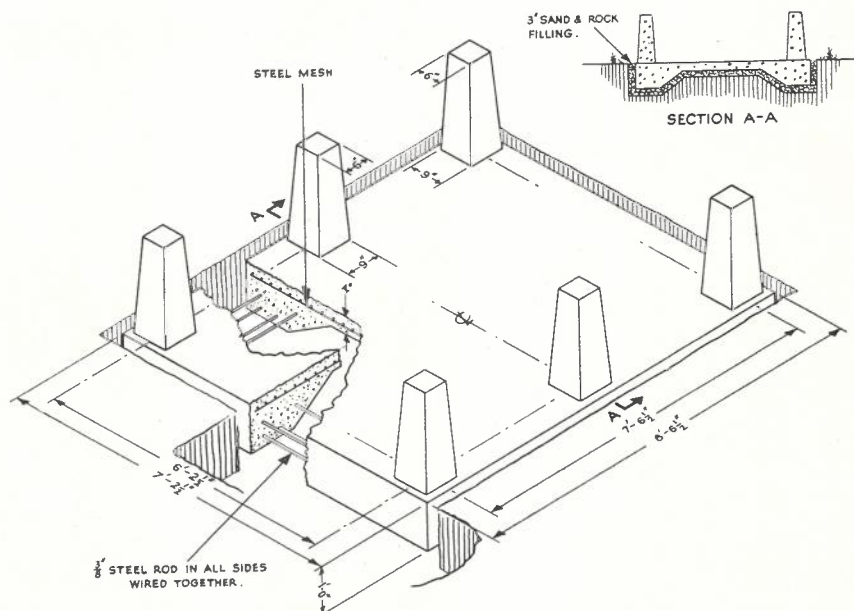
Detail of Reinforced Concrete Raft for R.A.X. Foundations.
